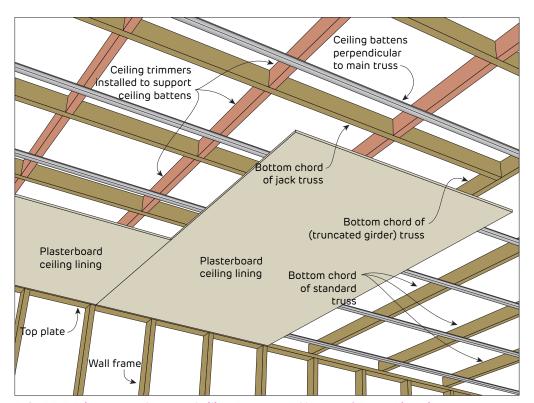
Trimmers to Support Ceiling Battens at Change of Truss DirectionPerspective
